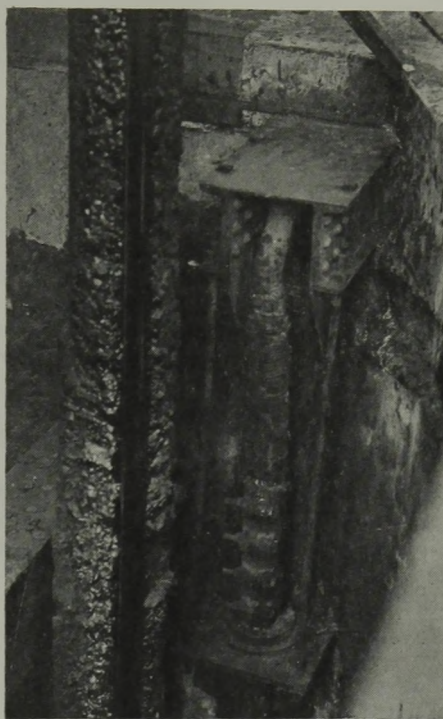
Suspension Cable Support; Shaft Depth, 520 Ft.
